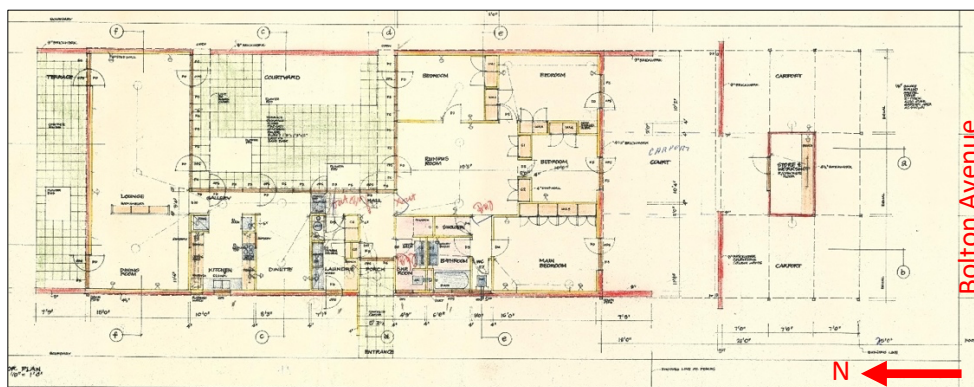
Floor plan, extracted from May 1963 building permit application drawings by Bernard Joyce & Associates Architects. Source: City of Sandringham Building Permit No. 1281.
